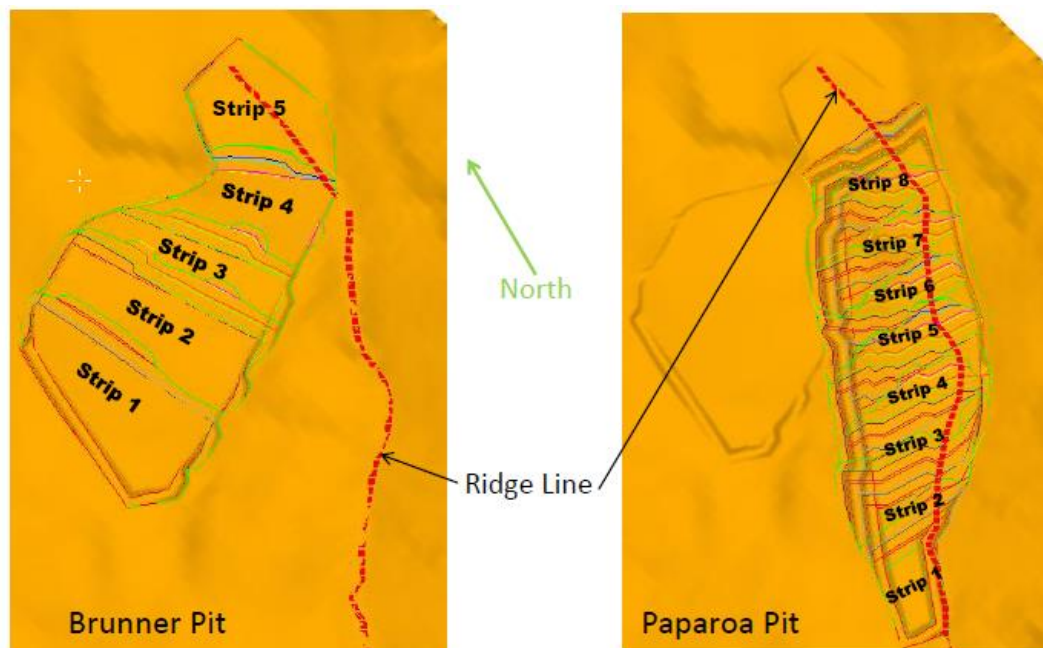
Proposed Mine Plan for the Te Kuha Mine
